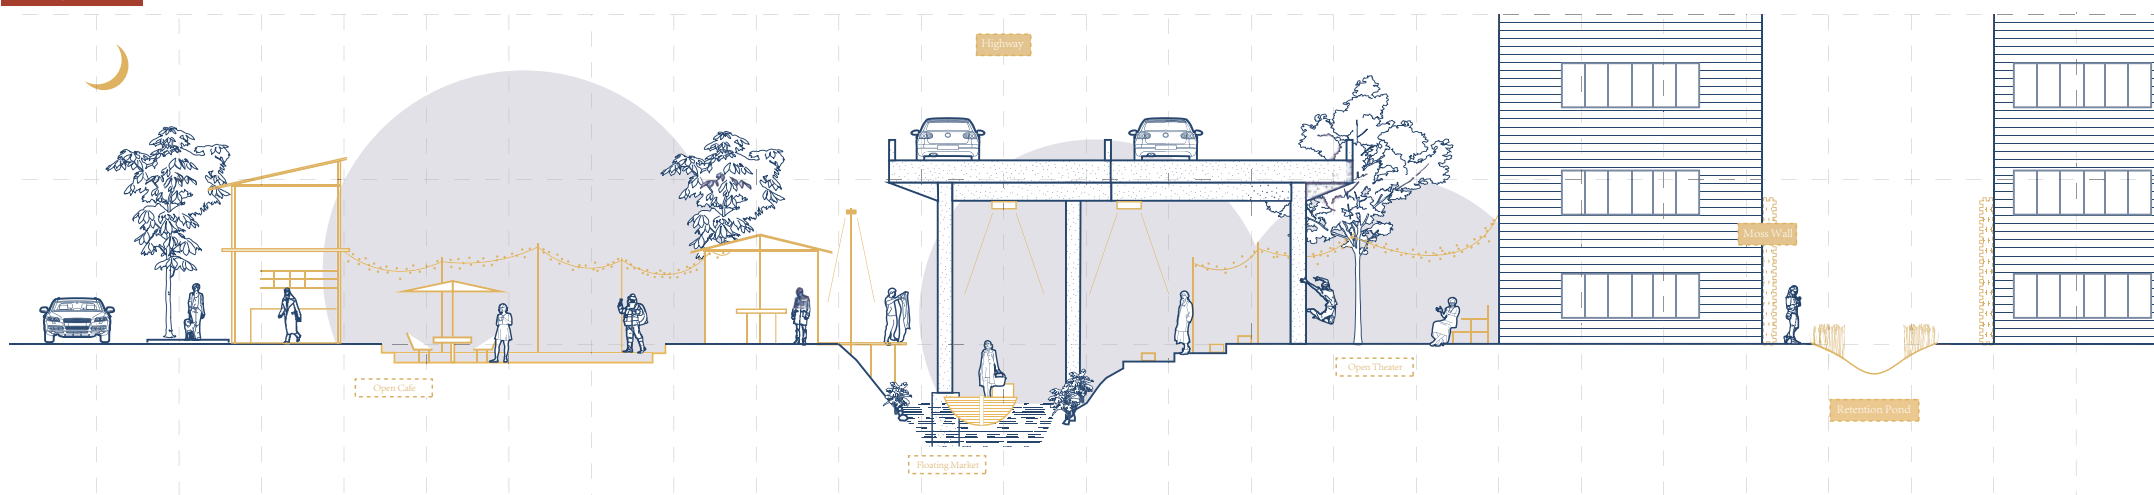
Design Exploration of Section 05, Drawn by Author
